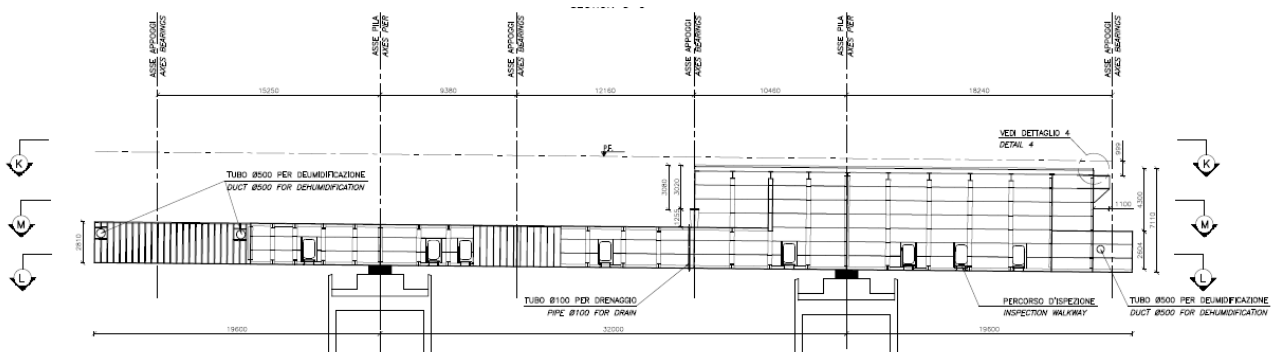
Access openings in longitudinal diaphragms (Calabria side shown)
